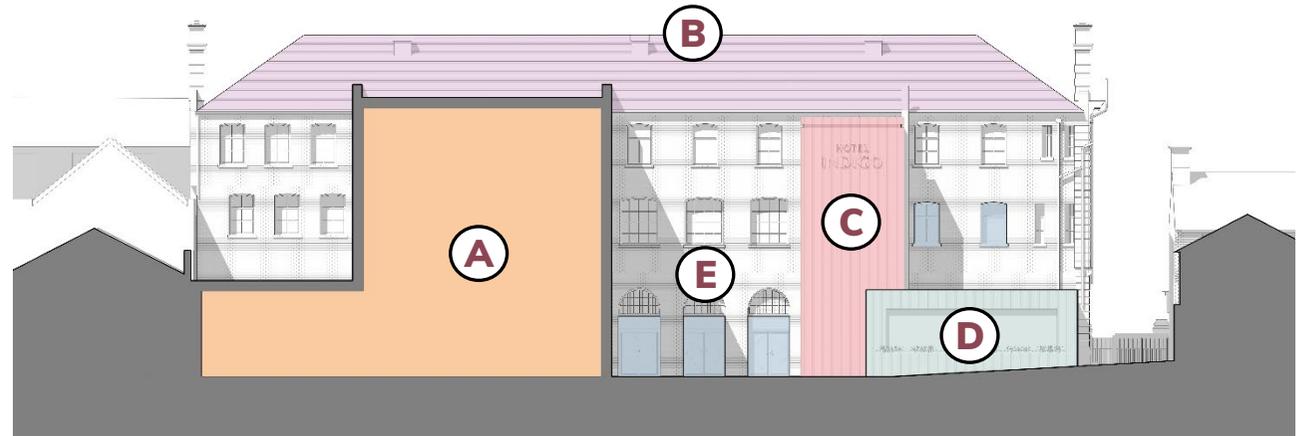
Proposed Alterations & Additions, Courtyard Façade, Post Office
